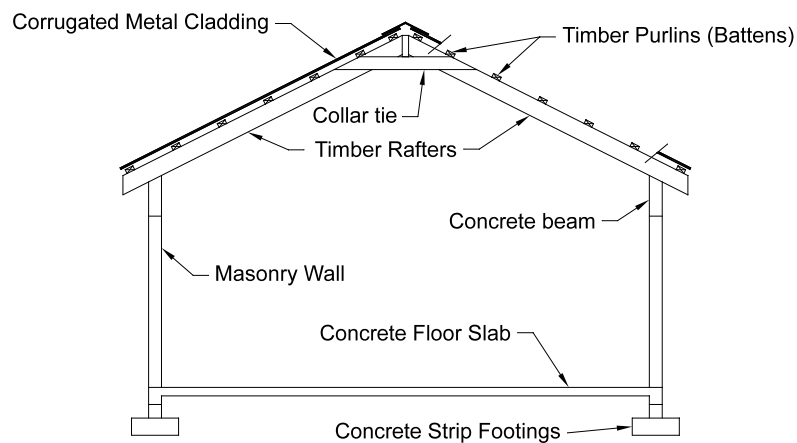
SECTION THROUGH HOUSE SHOWING ROOF
